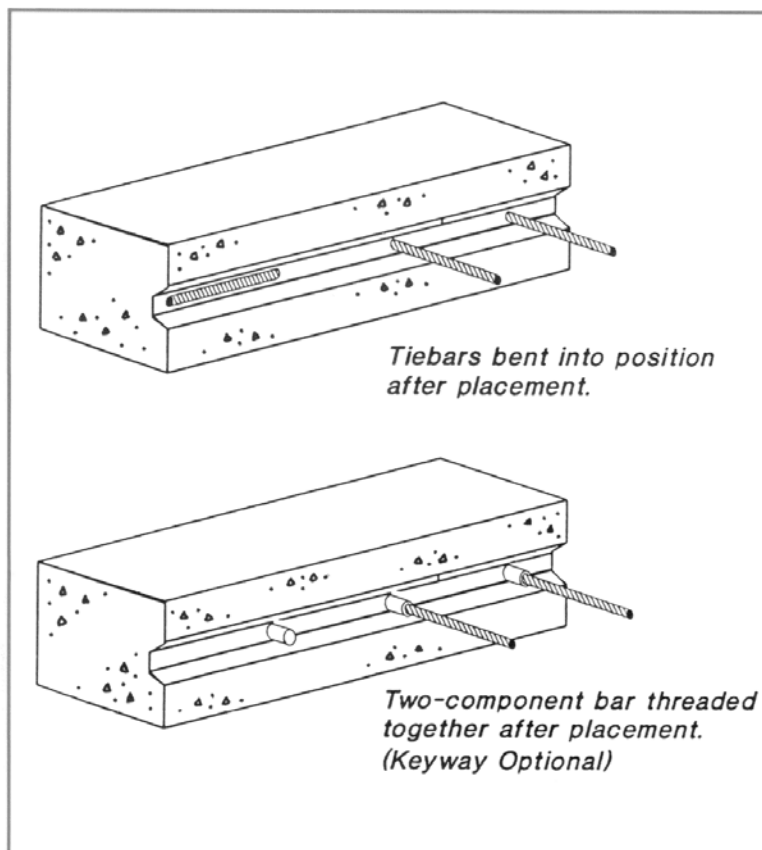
Typical placement of tiebars in fresh concrete (1).
